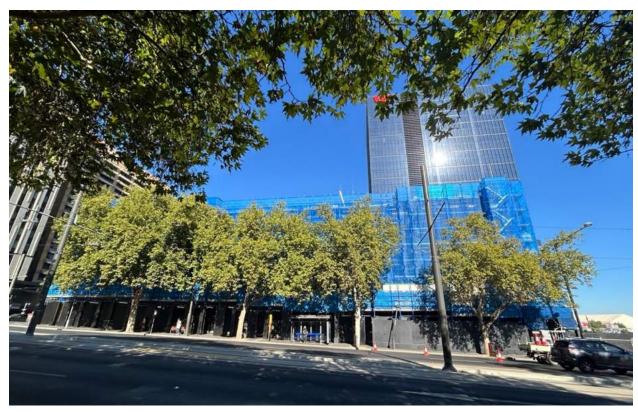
East façade of Parliament House viewed from King William Road. Festival Tower in the background. Construction works to Parliament House visible.
